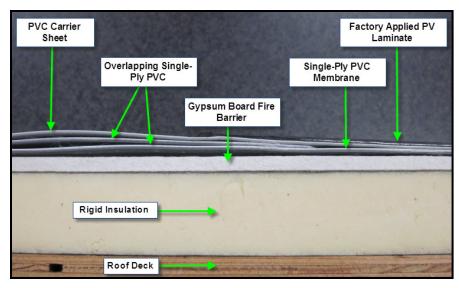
Cross-section of BIPV roof assembly without the conduit.
